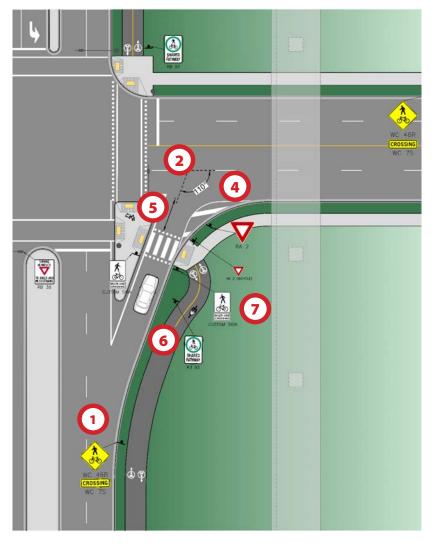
CHANNELIZED INTERSECTION WITH SEPARATED CROSSINGS
